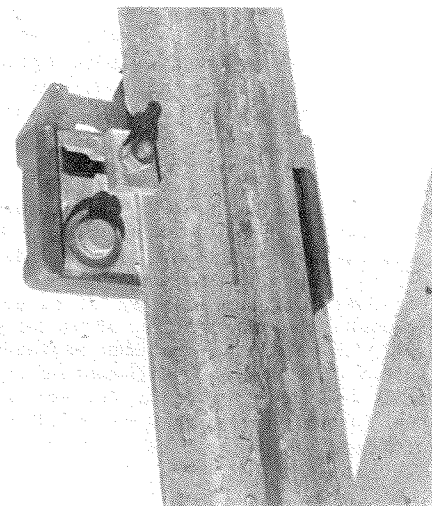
Landis rail fastener installed on BART aerial structure.
